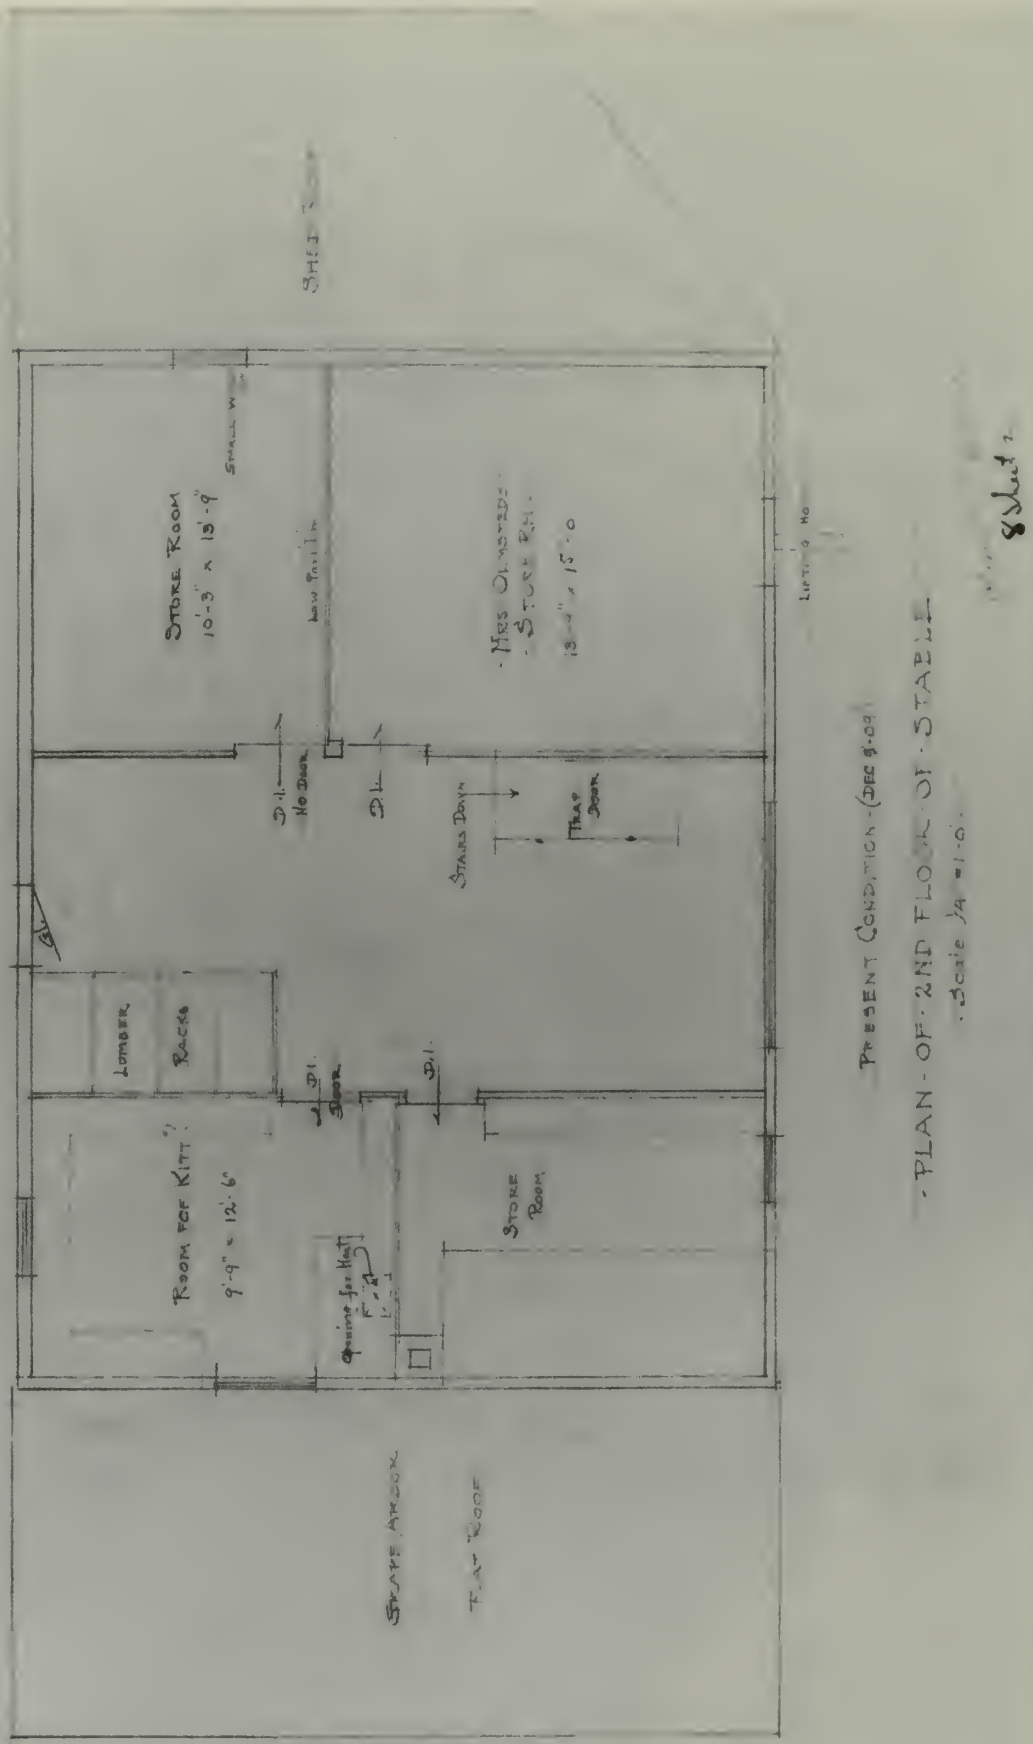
"Present Condition (Dec. 9, '09), Plan of 2nd Floor of Stable."
